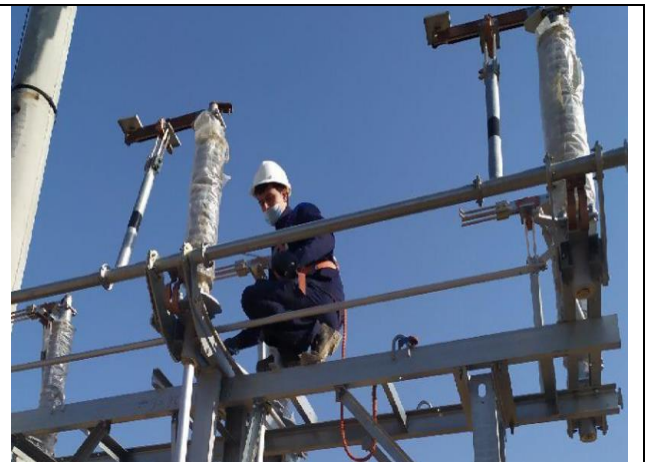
TSS Hakkulabad. Installer at work with protective equipment wearing special uniform at site.
